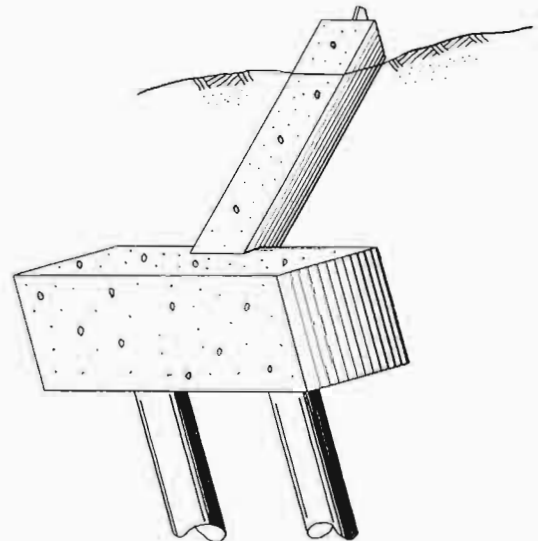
Reinforced-concrete guy anchor on piles for use in poor soils.
